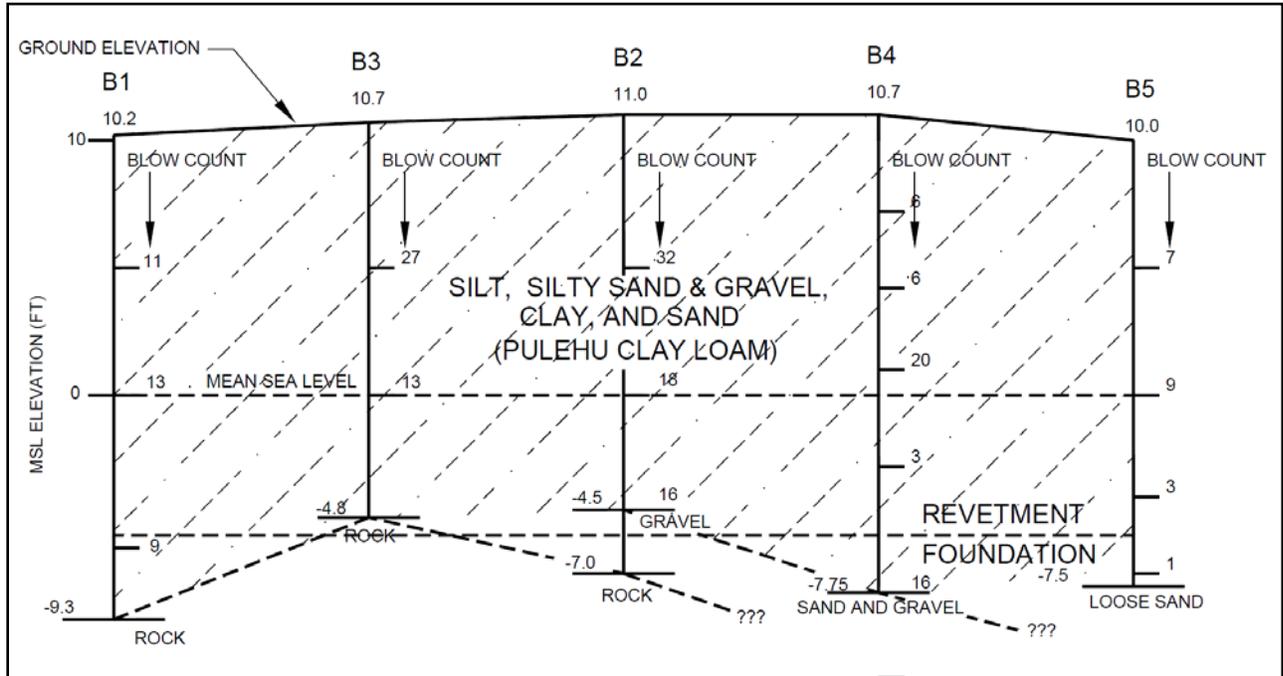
Schematic of foundation conditions (note: B1 is at the north end of the property)
